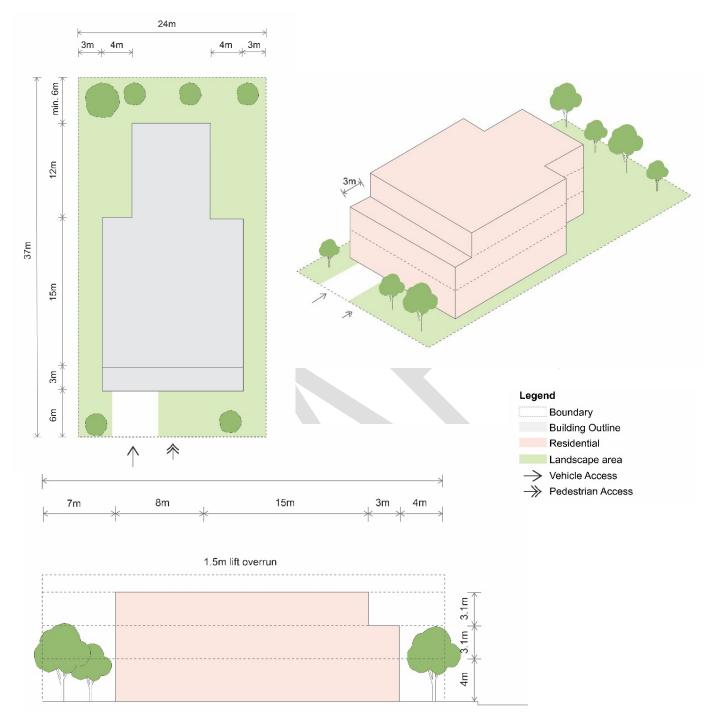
Indicative Old Canterbury Road east - northern site - storeys, building envelope, scale and site layout - plan, section and axonometric
